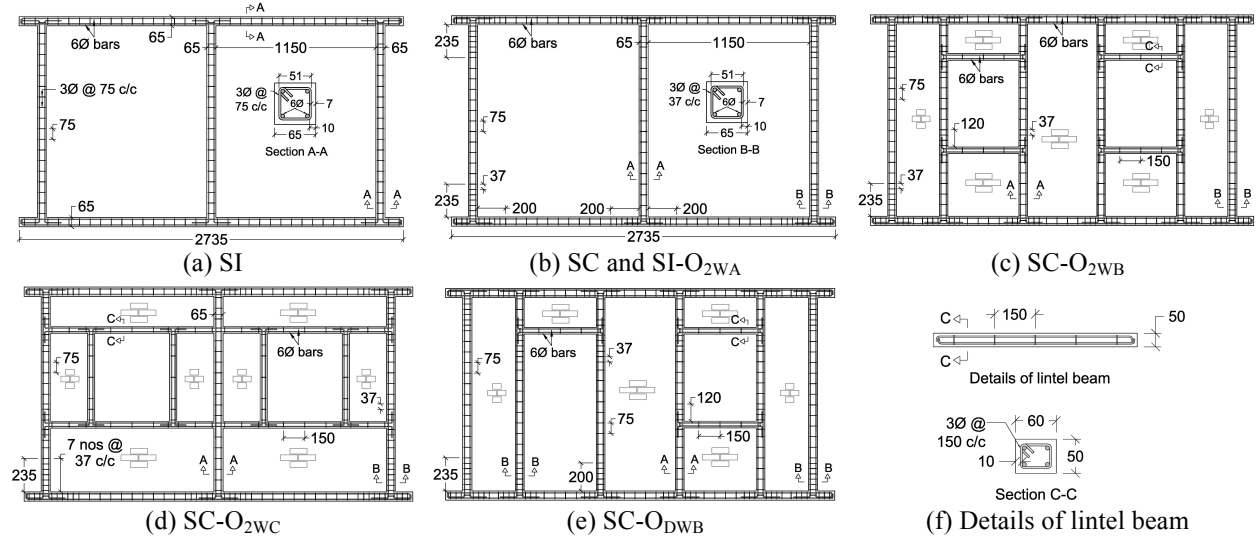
(a) – (f) Reinforcement details of RC members in masonry wall specimens
